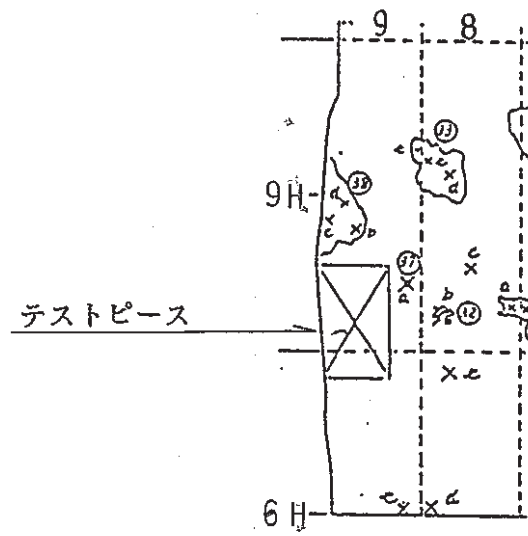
1 3 Cutting Position of Testpieces (Umeda)
